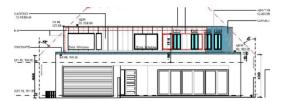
Presentation of the new addition to the streetscape (north elevation).
